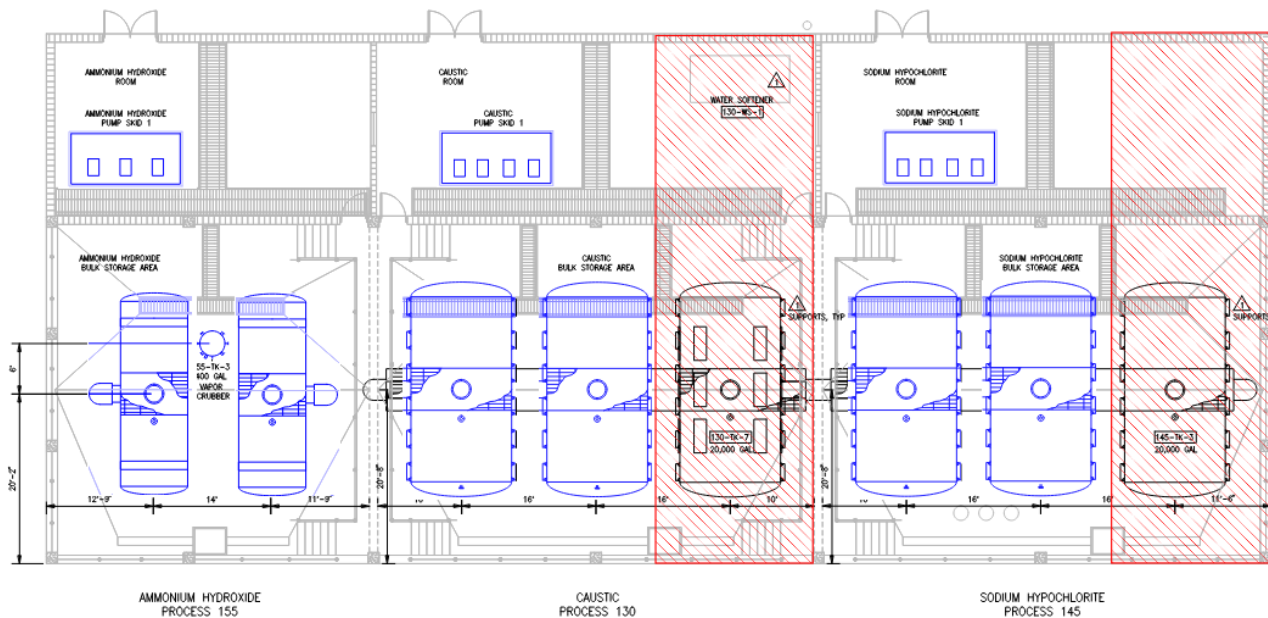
Concept Layout of Proposed Hypochlorite Storage and Feed Building
